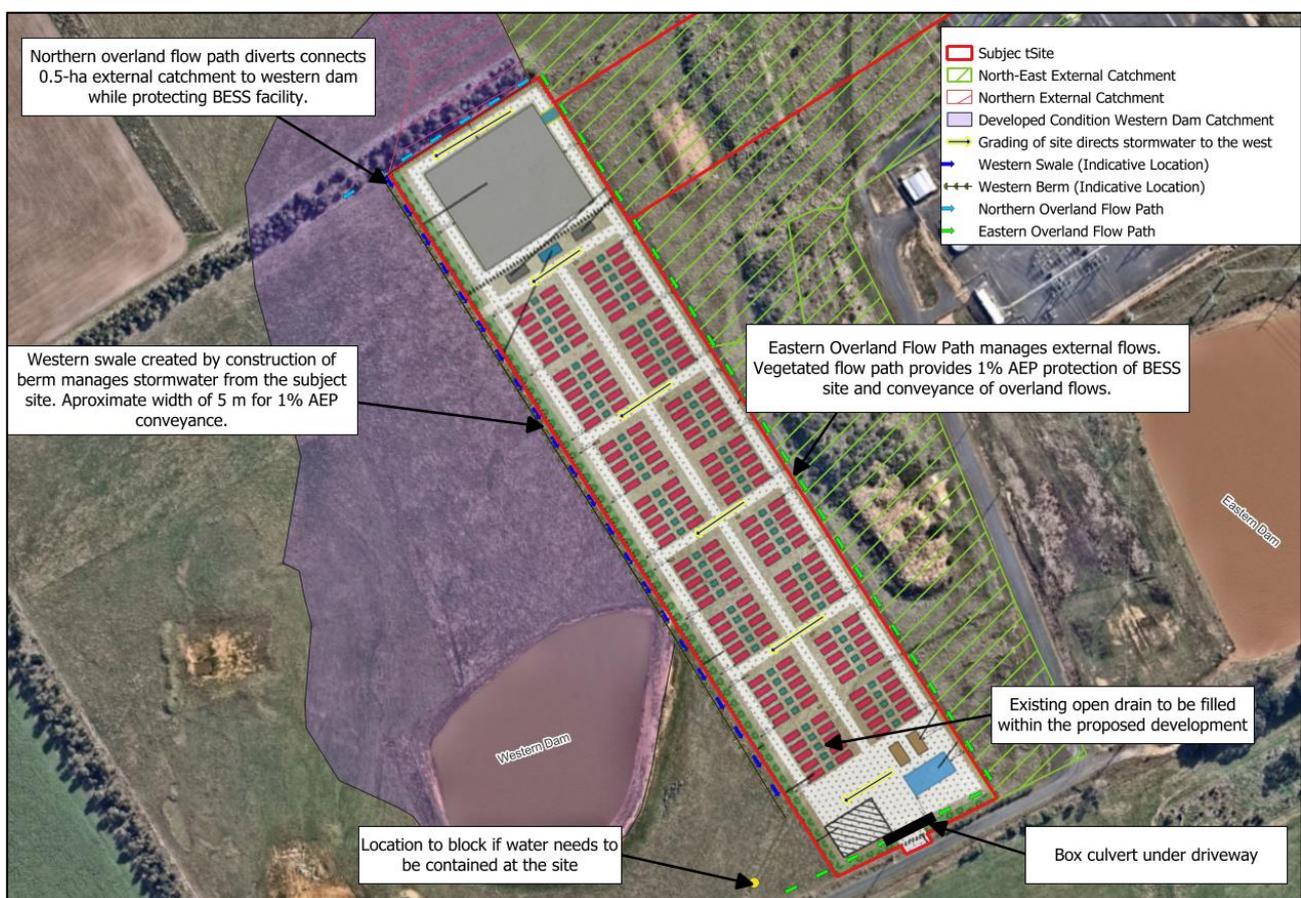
Proposed Stormwater Management Strategy Layout Plan
